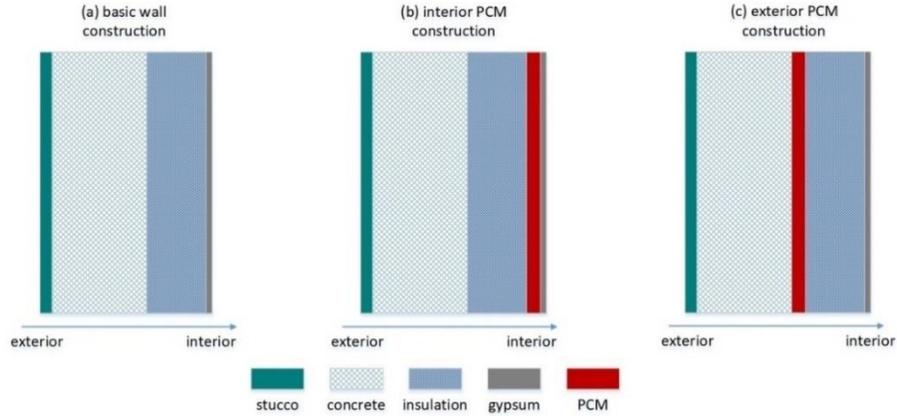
Basic wall and PCM position construction settings, (a) basic wall construction used in the benchmark cases; (b) interior PCM position construction; (c) exterior PCM position construction.
